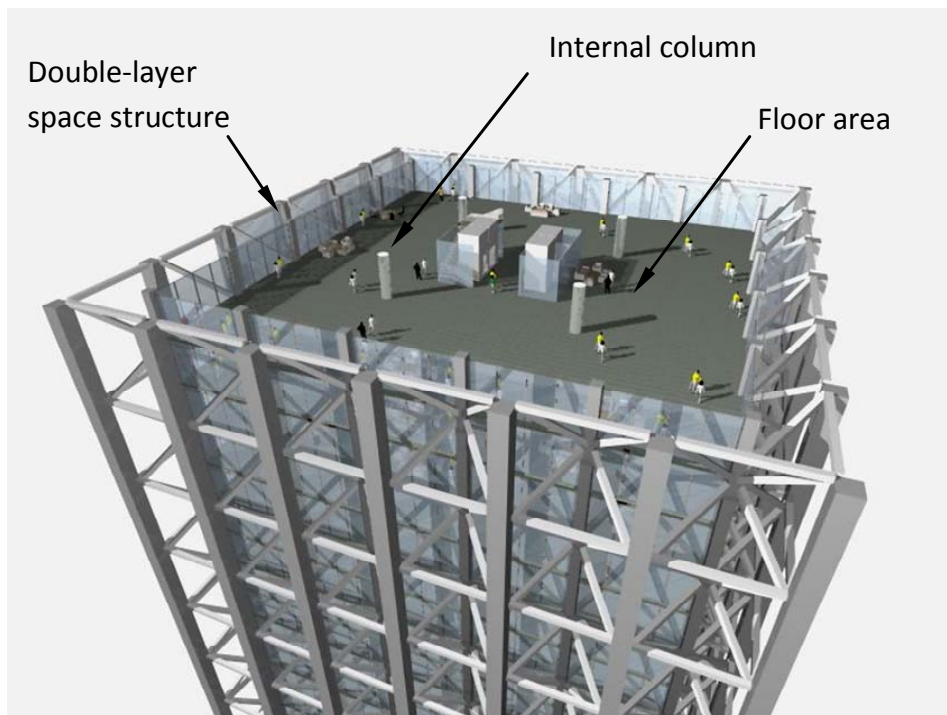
A double-layer space structure as a vertical structure of tall buildings
